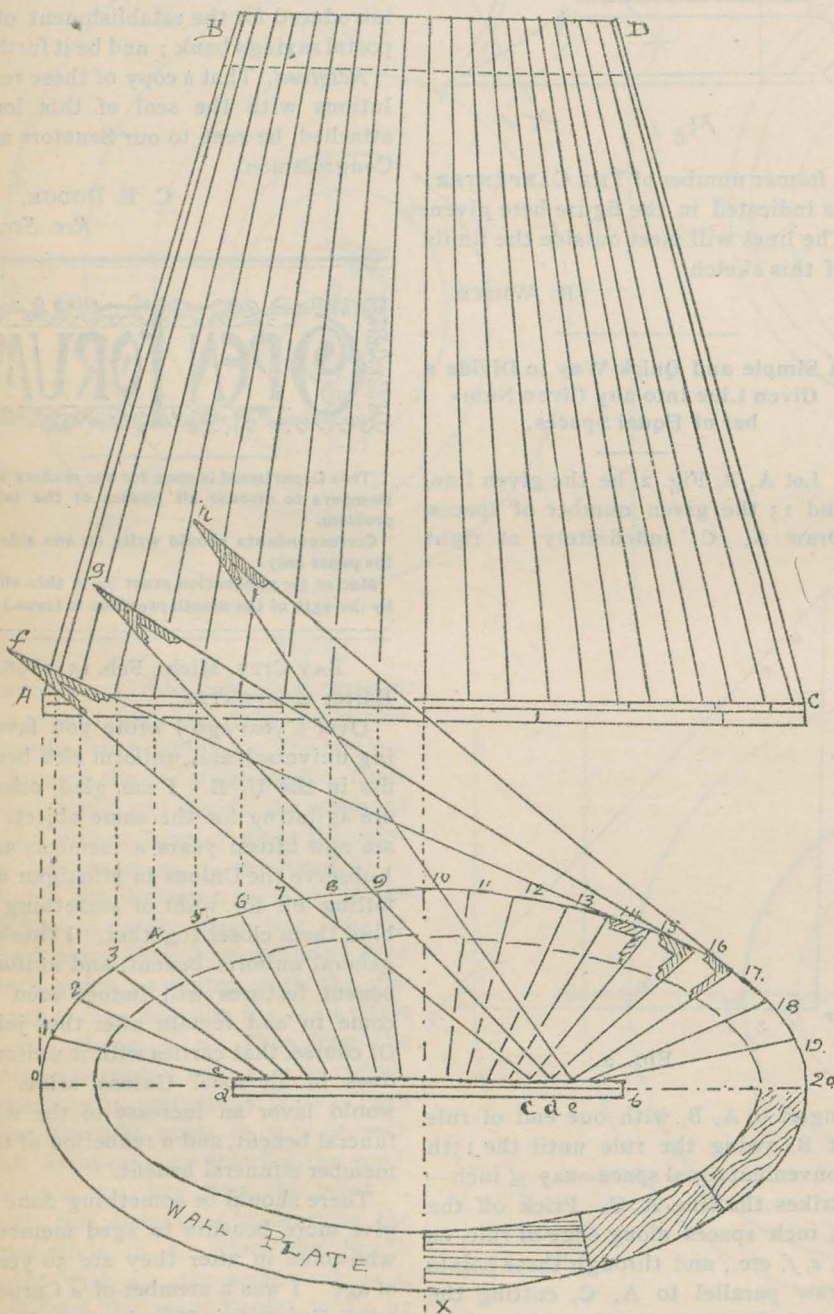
PLAN AND ELEVATION OF ROOF $\frac{1}{4}$ IN. SCALE.
